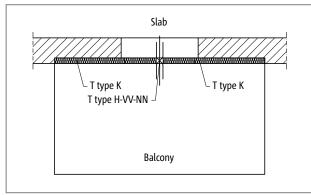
Schöck Isokorb® T type H: Cantilevered balcony
